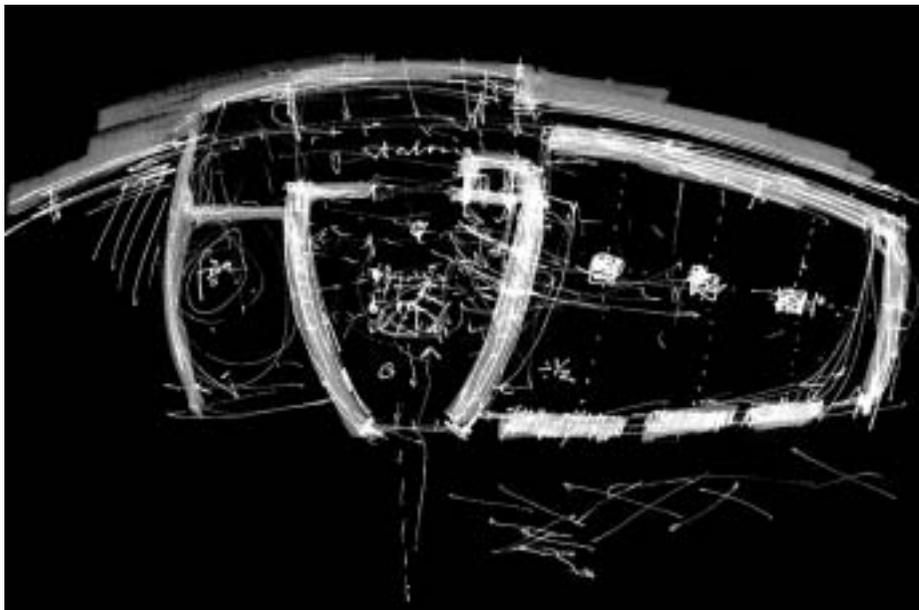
Early sketch plan showing smaller exhibition wing on the right and monorail station located behind the central circulation space.
